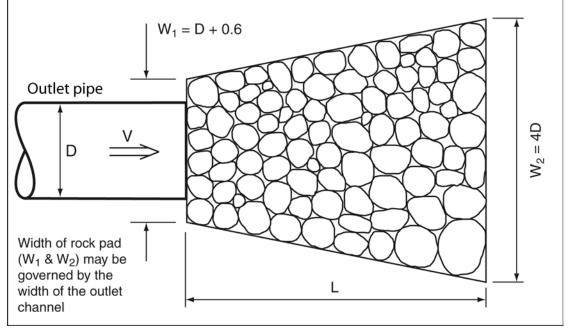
Typical layout of a rock pad for a single pipe outlet (plan view)
